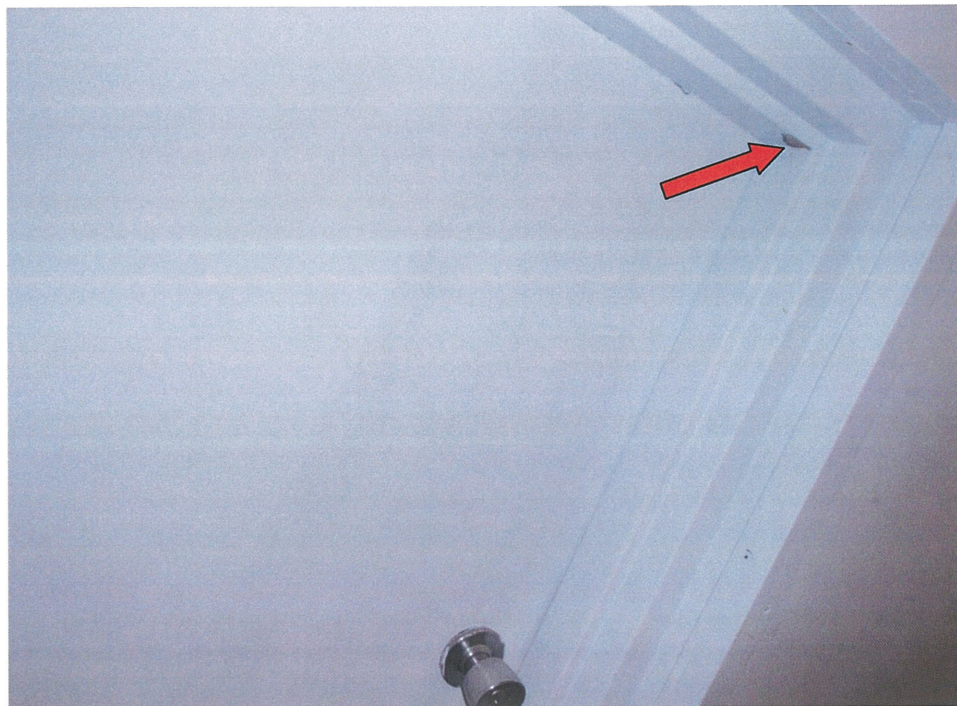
Lead-based beige wall trim in Room 120 (Sample P10).
